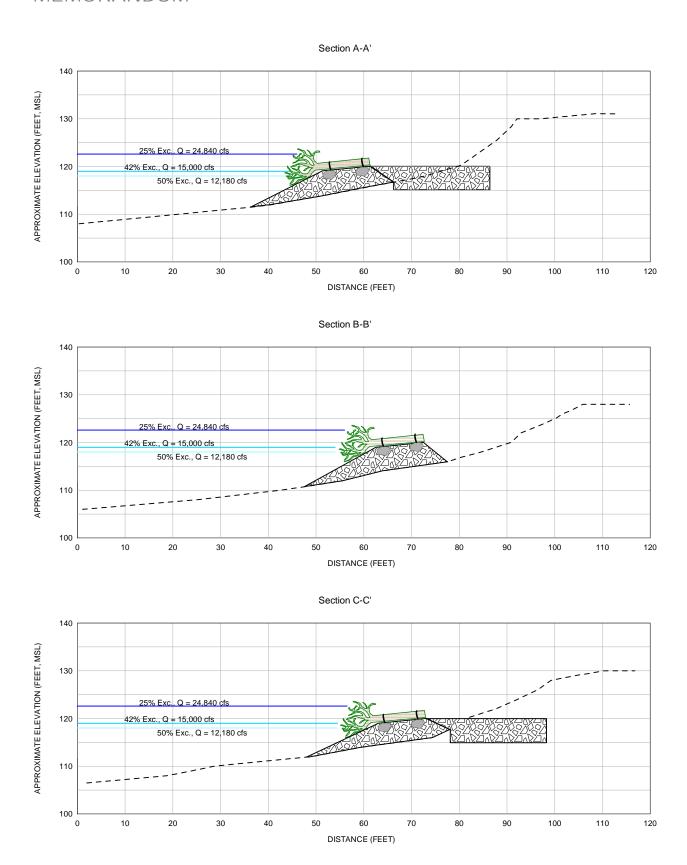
Typical sections of the rock-toe/brush revetment showing design flows and elevations.
